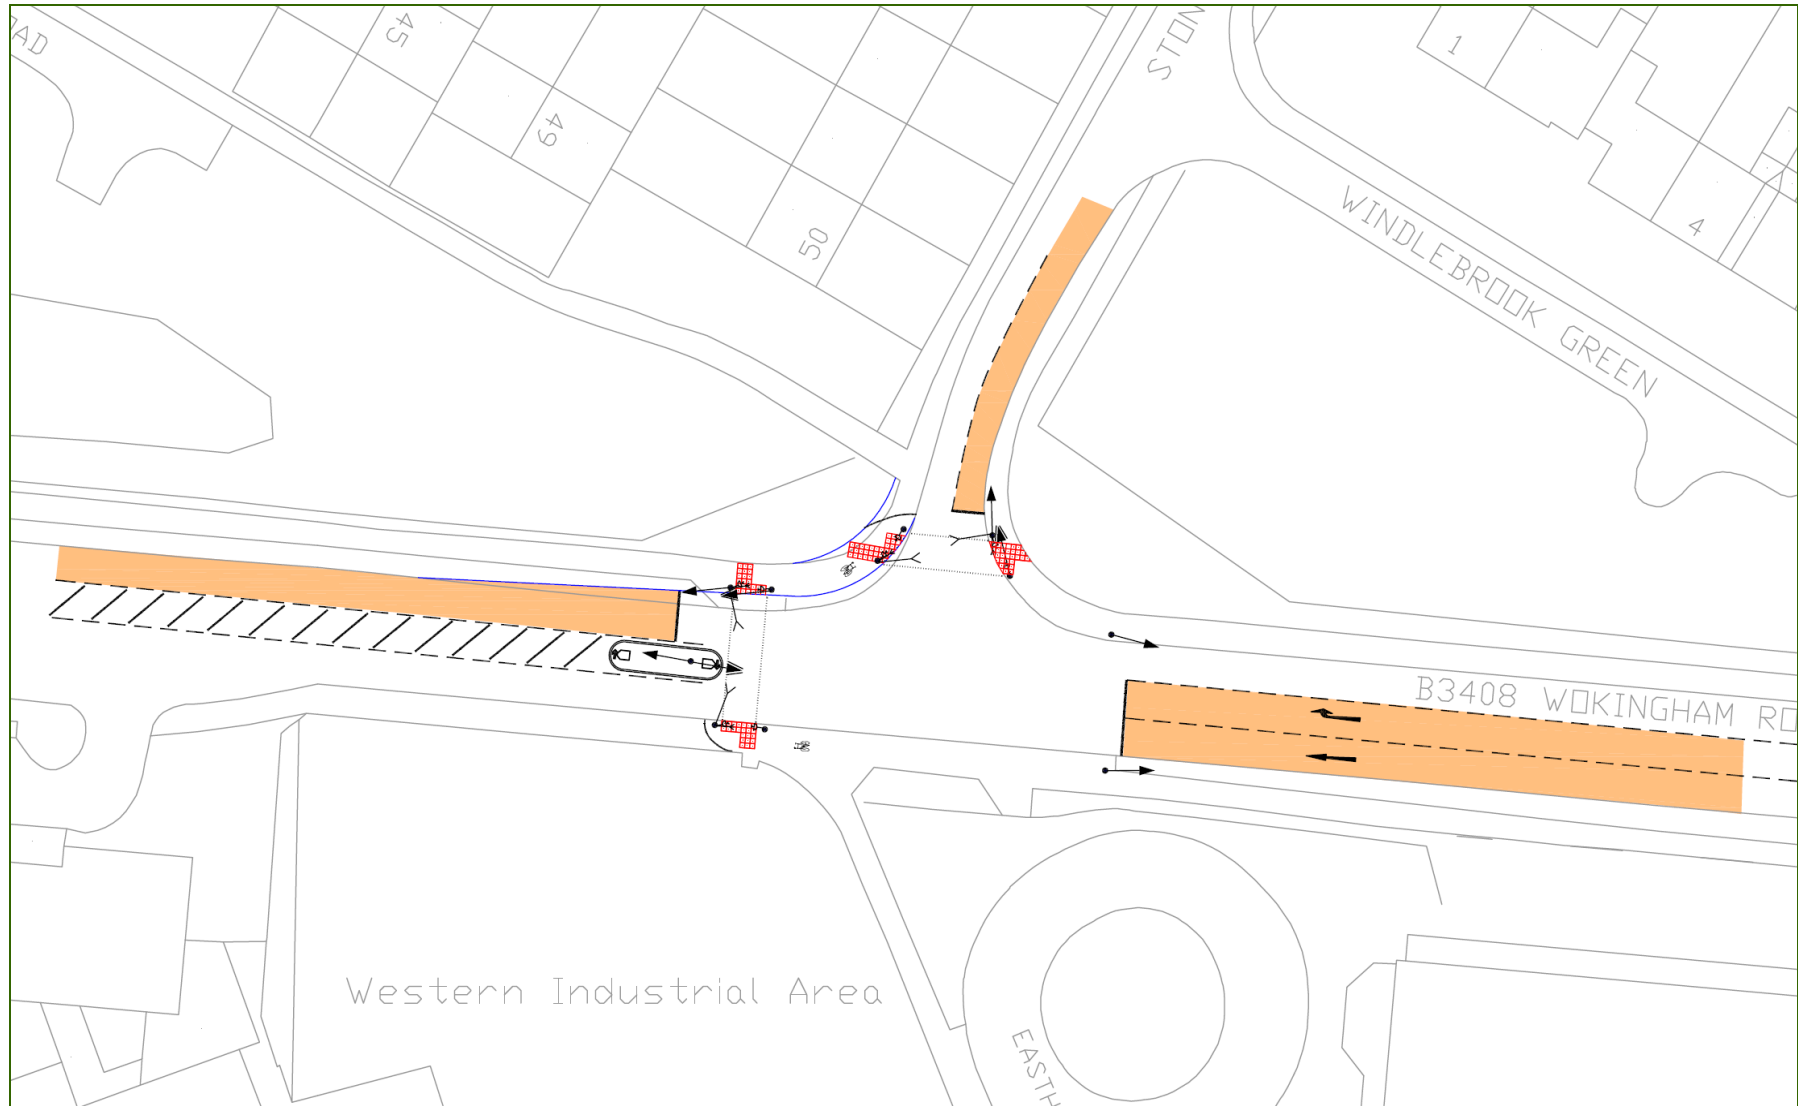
Binfield Road / Moordale Avenue Junction Improvement Scheme
